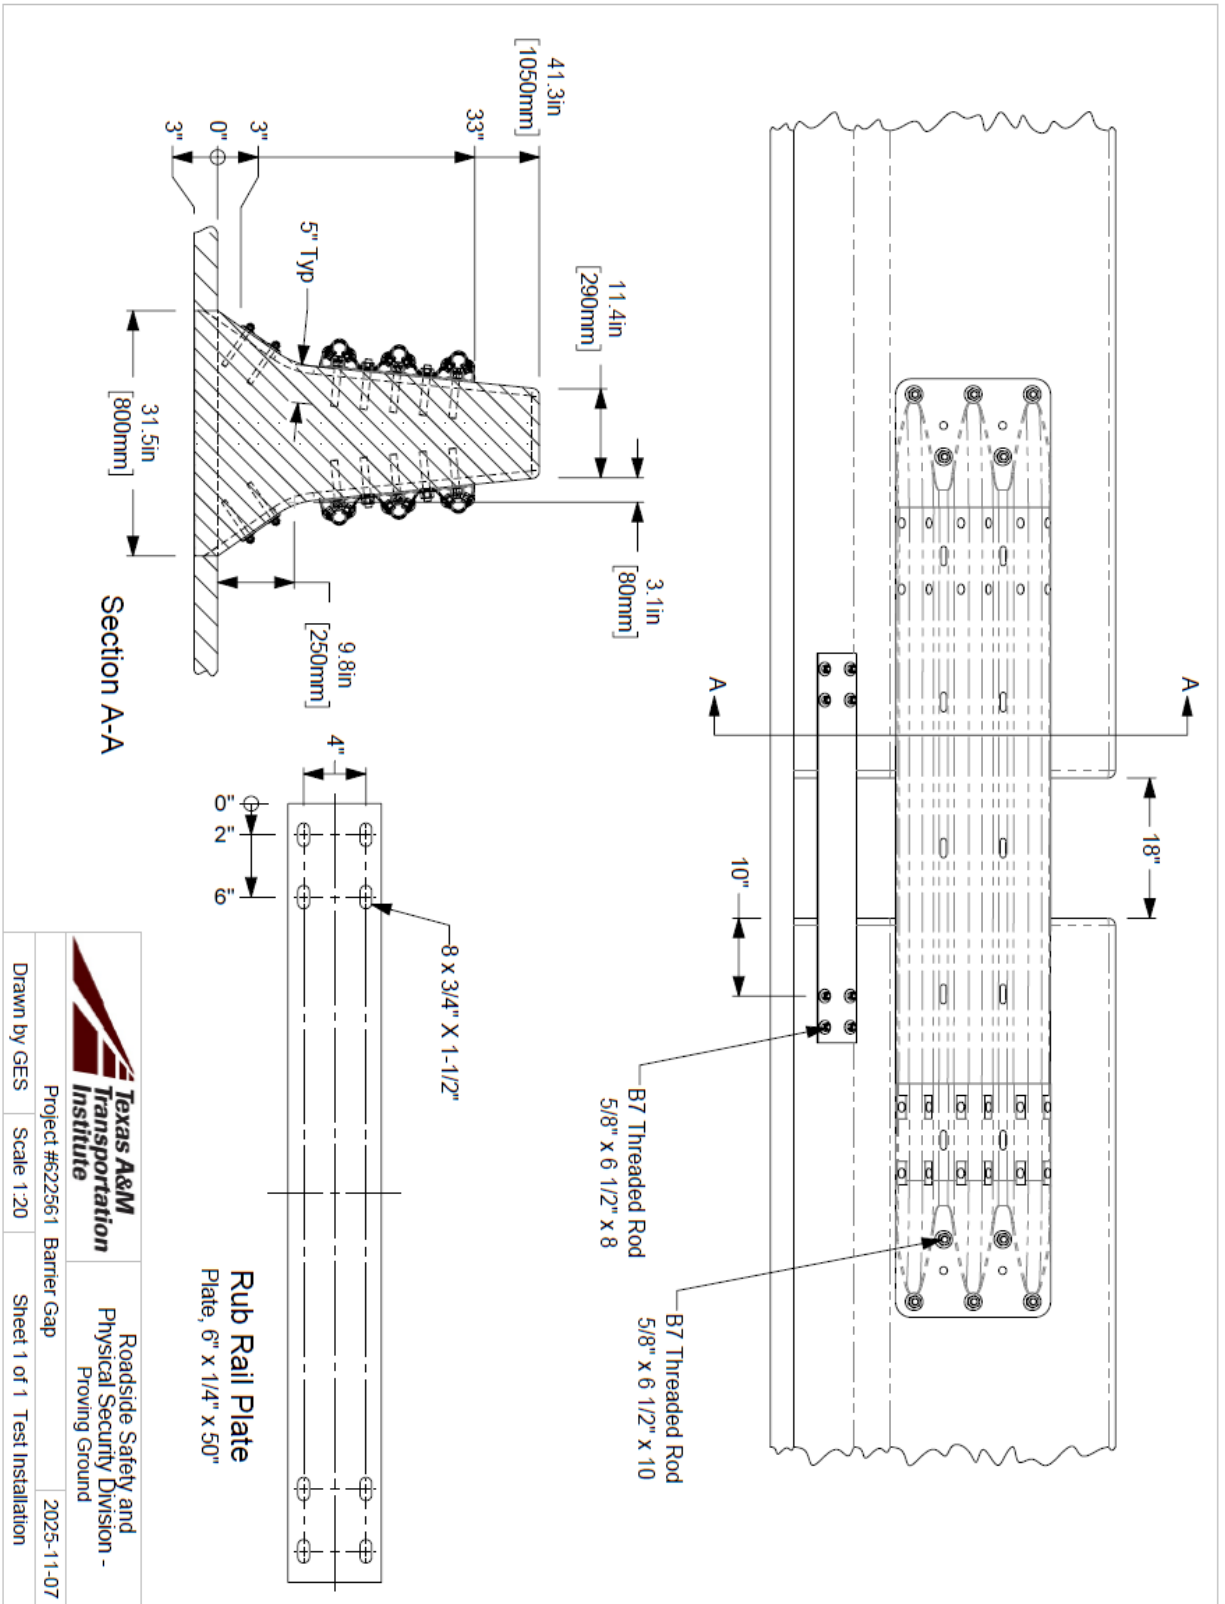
Bridging 18-inch Gap Concrete Barriers
